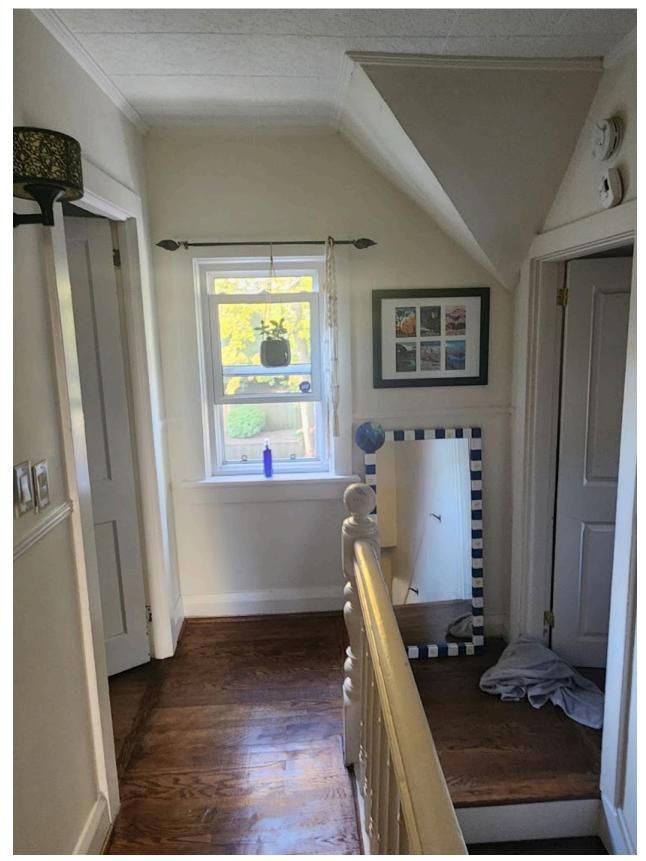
View of hallway at second floor showing rear window. Window opening to be extended to floor to accommodate access to new primary bedroom. (Photo by owner, October 2024)
